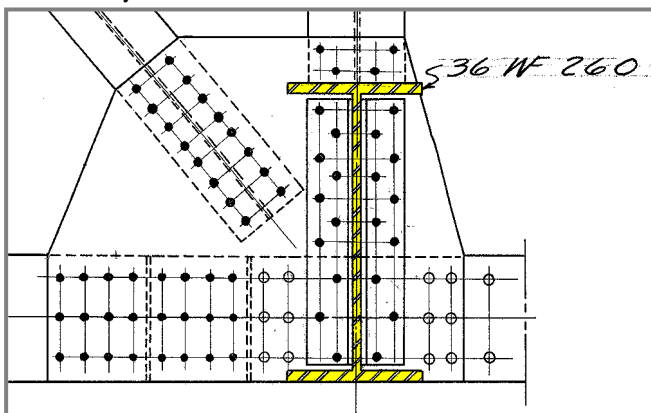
Example of floorbeam end framed into gusset plate (floorbeam highlighted in yellow).
